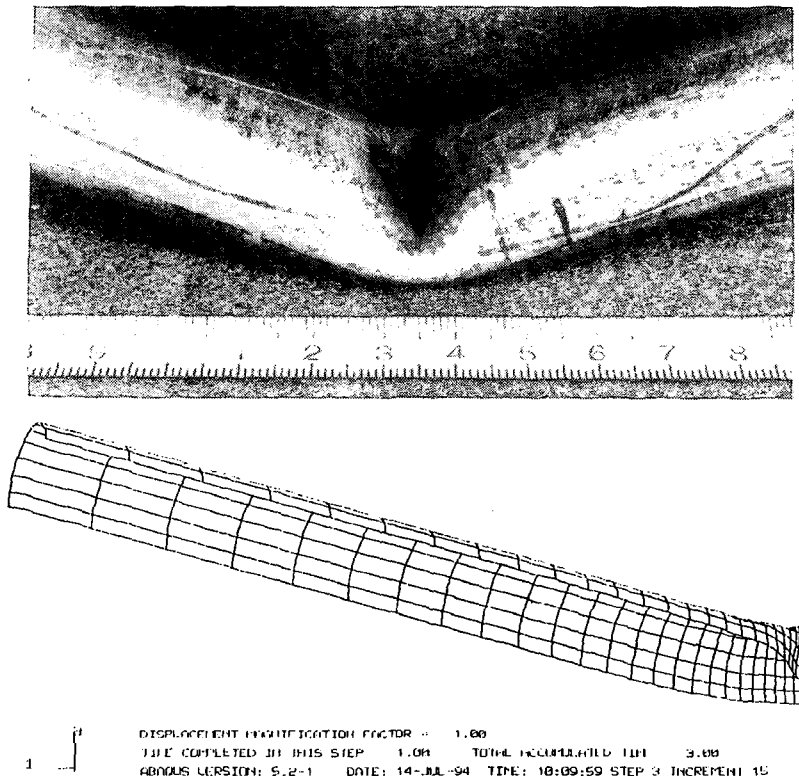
Buckled pipe specimen at 3-point bending test and predicted shape at 68 mm punch stroke
